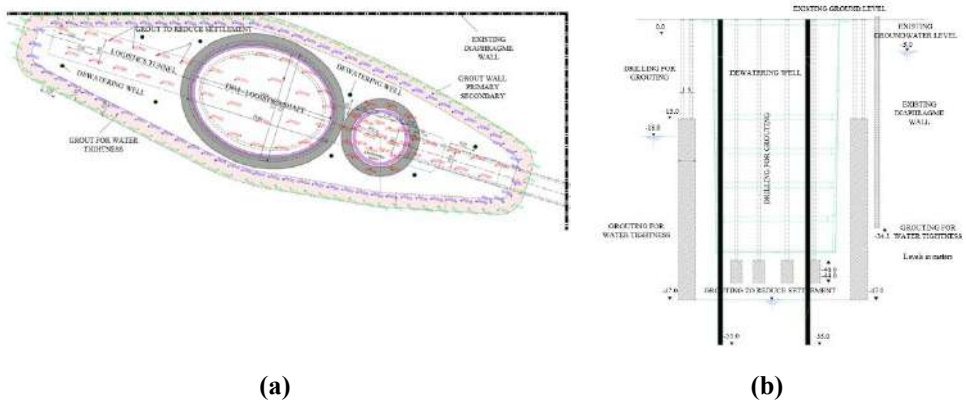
Rock grouting primary, secondary and tertiary plan (a) and section (b).
